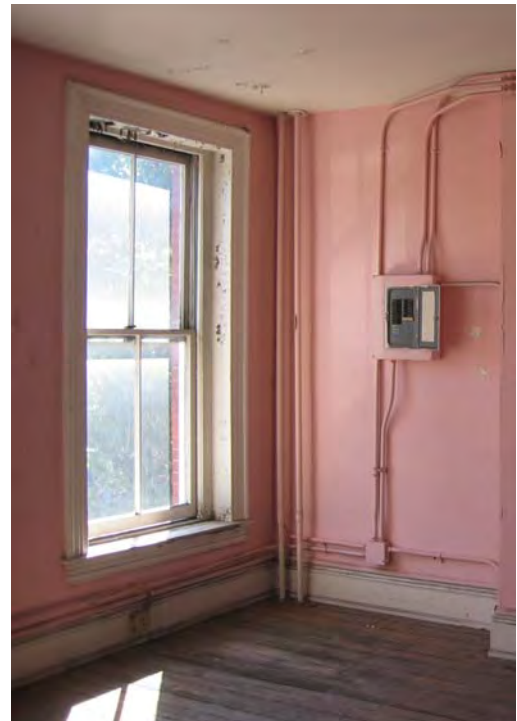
Surface mounted conduit and box. (Photo: BBB, 2006)
